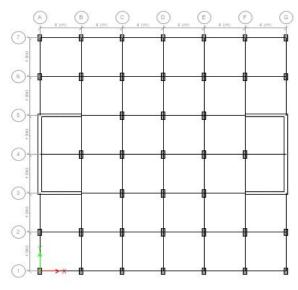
Model 4 (Building with "U" shaped shear wall)
